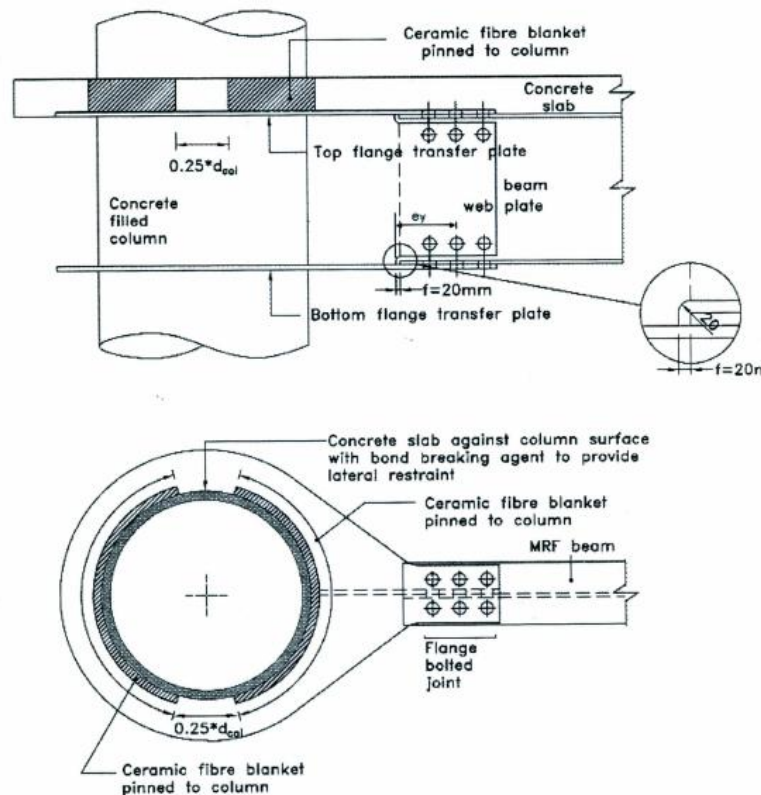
CHS Collar Detail with FBJ Connection (Clifton, 2005)
